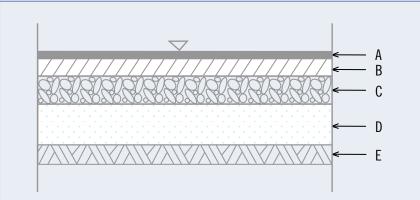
Flexible Pavement (Type III) For Local Access Roads
